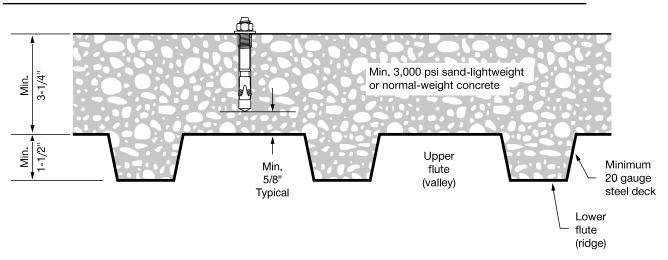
Installation of the KWIK Bolt TZ on the top of sand-lightweight concrete over metal deck floor and roof assemblies
